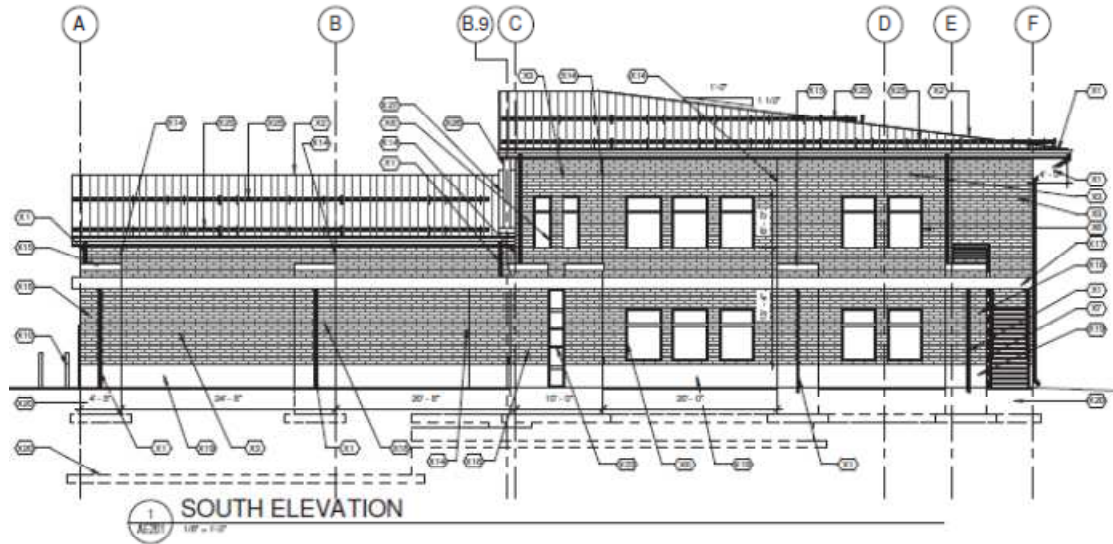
Exhibit F - Architectural Elevations of the Mechanical Dewatering & Solids Storage buildings
